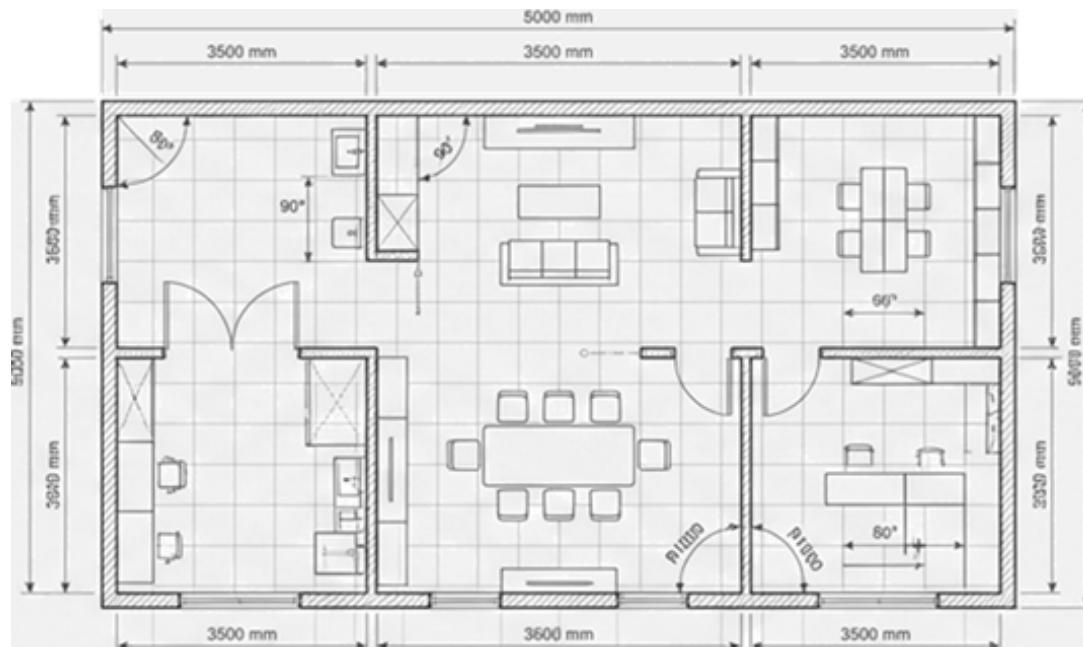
2D Floor Plan Output: Architectural top-down view with precise millimeter-level dimensions supporting professional room layout design (FR-19). Grid system ensures accurate placement and measurement.
